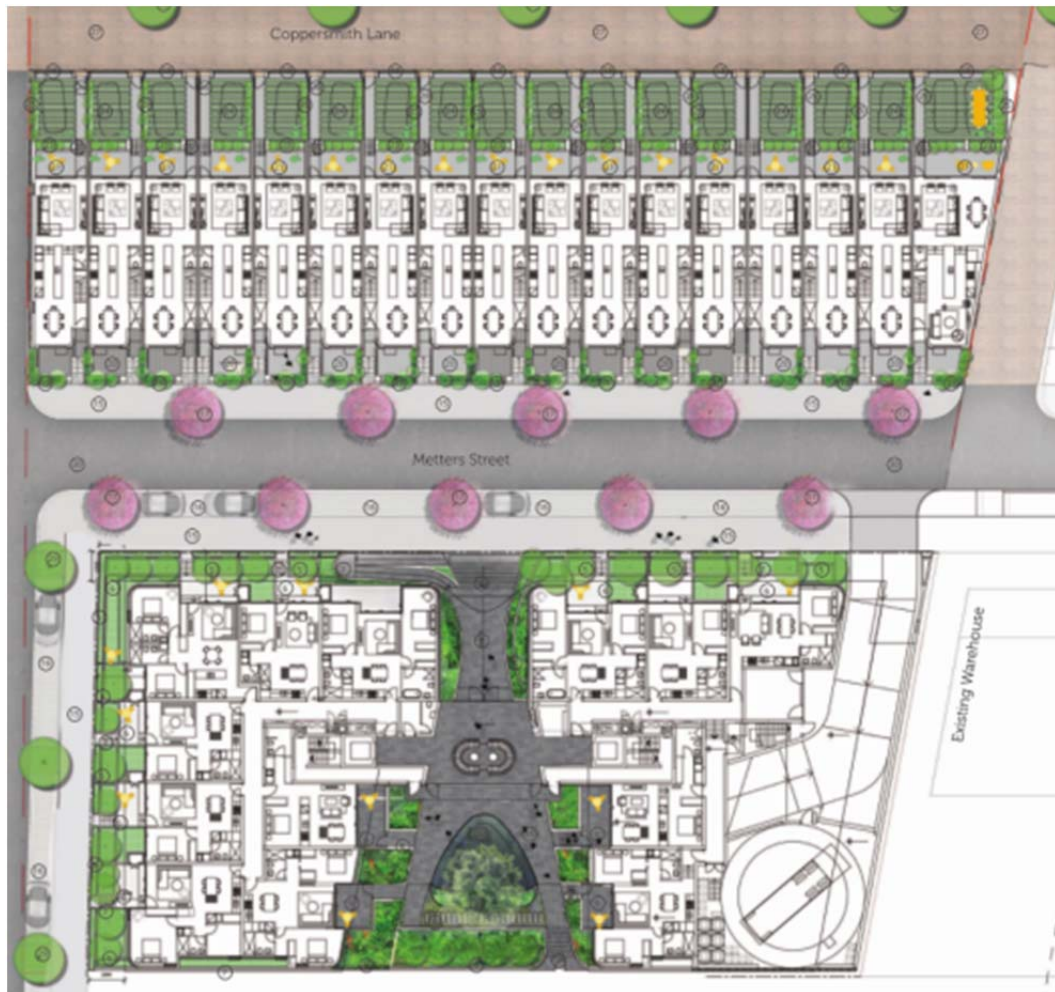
Detail of landscaping for site (not including dedicated pedestrian walkway to the south).
